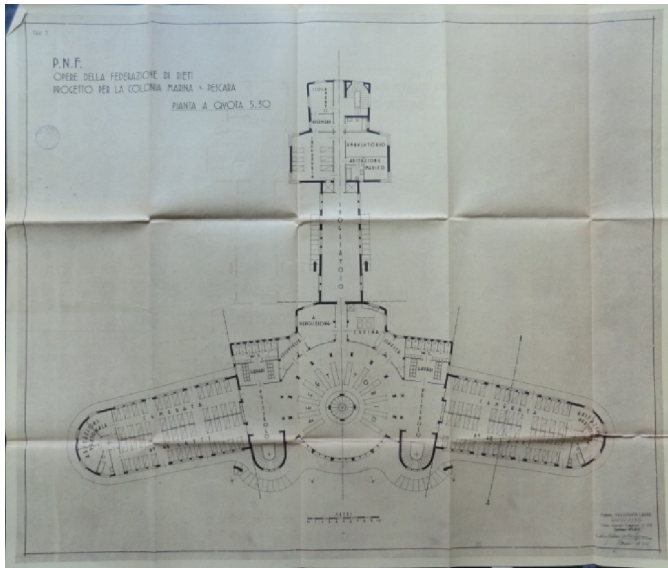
Colony Stella Maris, Montesilvano (PE): Plan of the first floor of the building (Archivio Centrale dello Stato)
